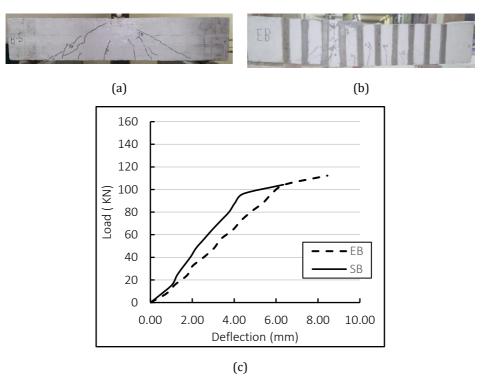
(a) Damaged beam for EB, (b) Failure Mode of beam EB, (c) Deflections of beams EB and SB
